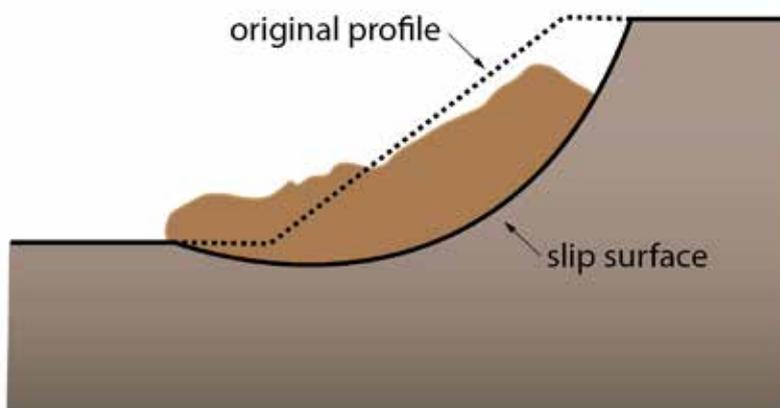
Bearing Capacity Failure of Pond Embankment
